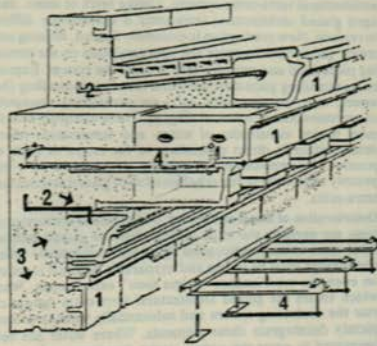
Typical Construction Detail of Glazed Architectural Terra-Cotta Ornament. Construction detailing was often complex. The terra-cotta units (1) which were laid in mortar were fitted with holes or slots to receive the metal anchors (2) (often called "Z" straps or "light iron") which were often fitted directly to the building frame. Masonry backfill (3) (either brick or poured cement) was laid between the terra-cotta units, with the building frame encasing the metal anchor. Overhanging or protruding elements were further secured by metal dowels or outriggers (4). (Detail, *Architectural Terra-Cotta*, Charles E. White, Jr., 1920)
